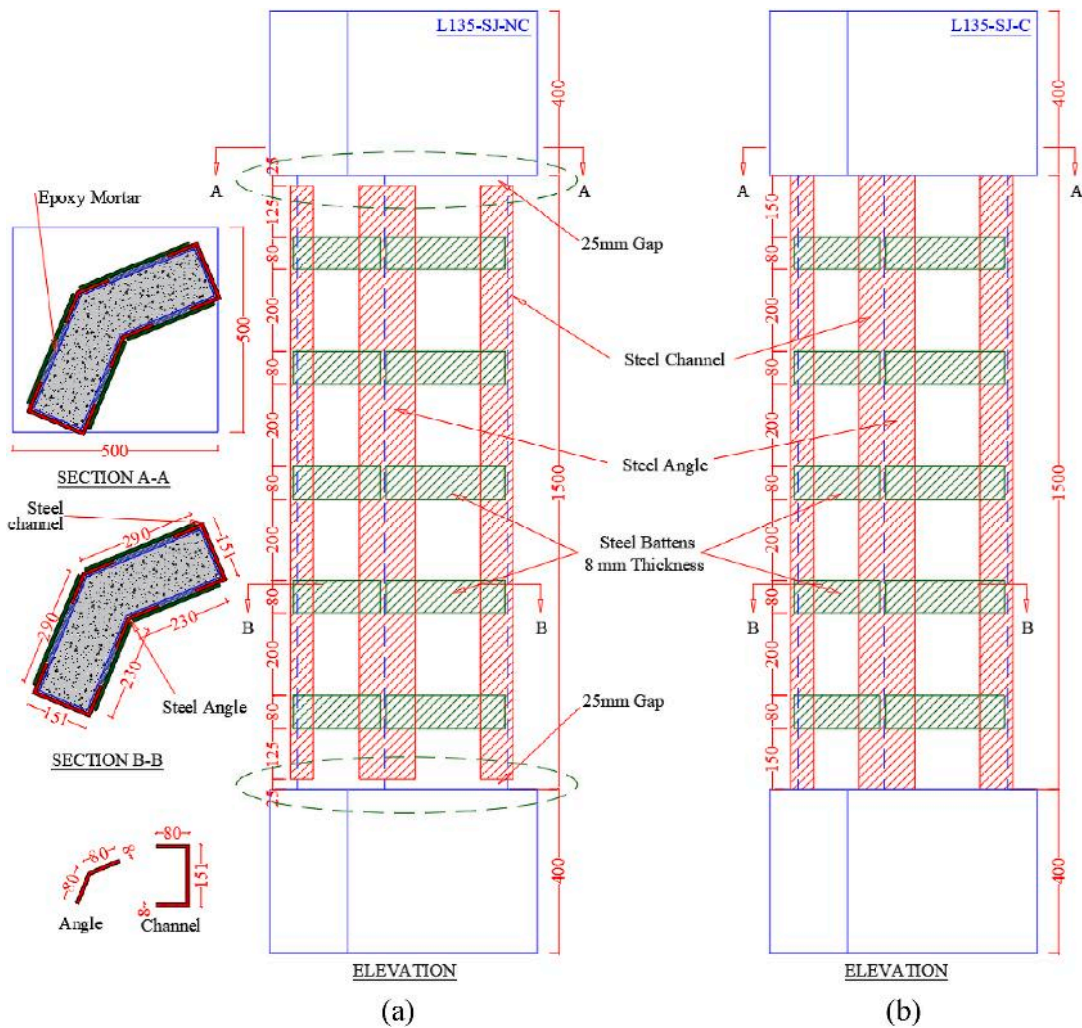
Details of 135° L-shaped steel jacket: (a) Disconnected steel jacket; (b) Connected steel jacket.
